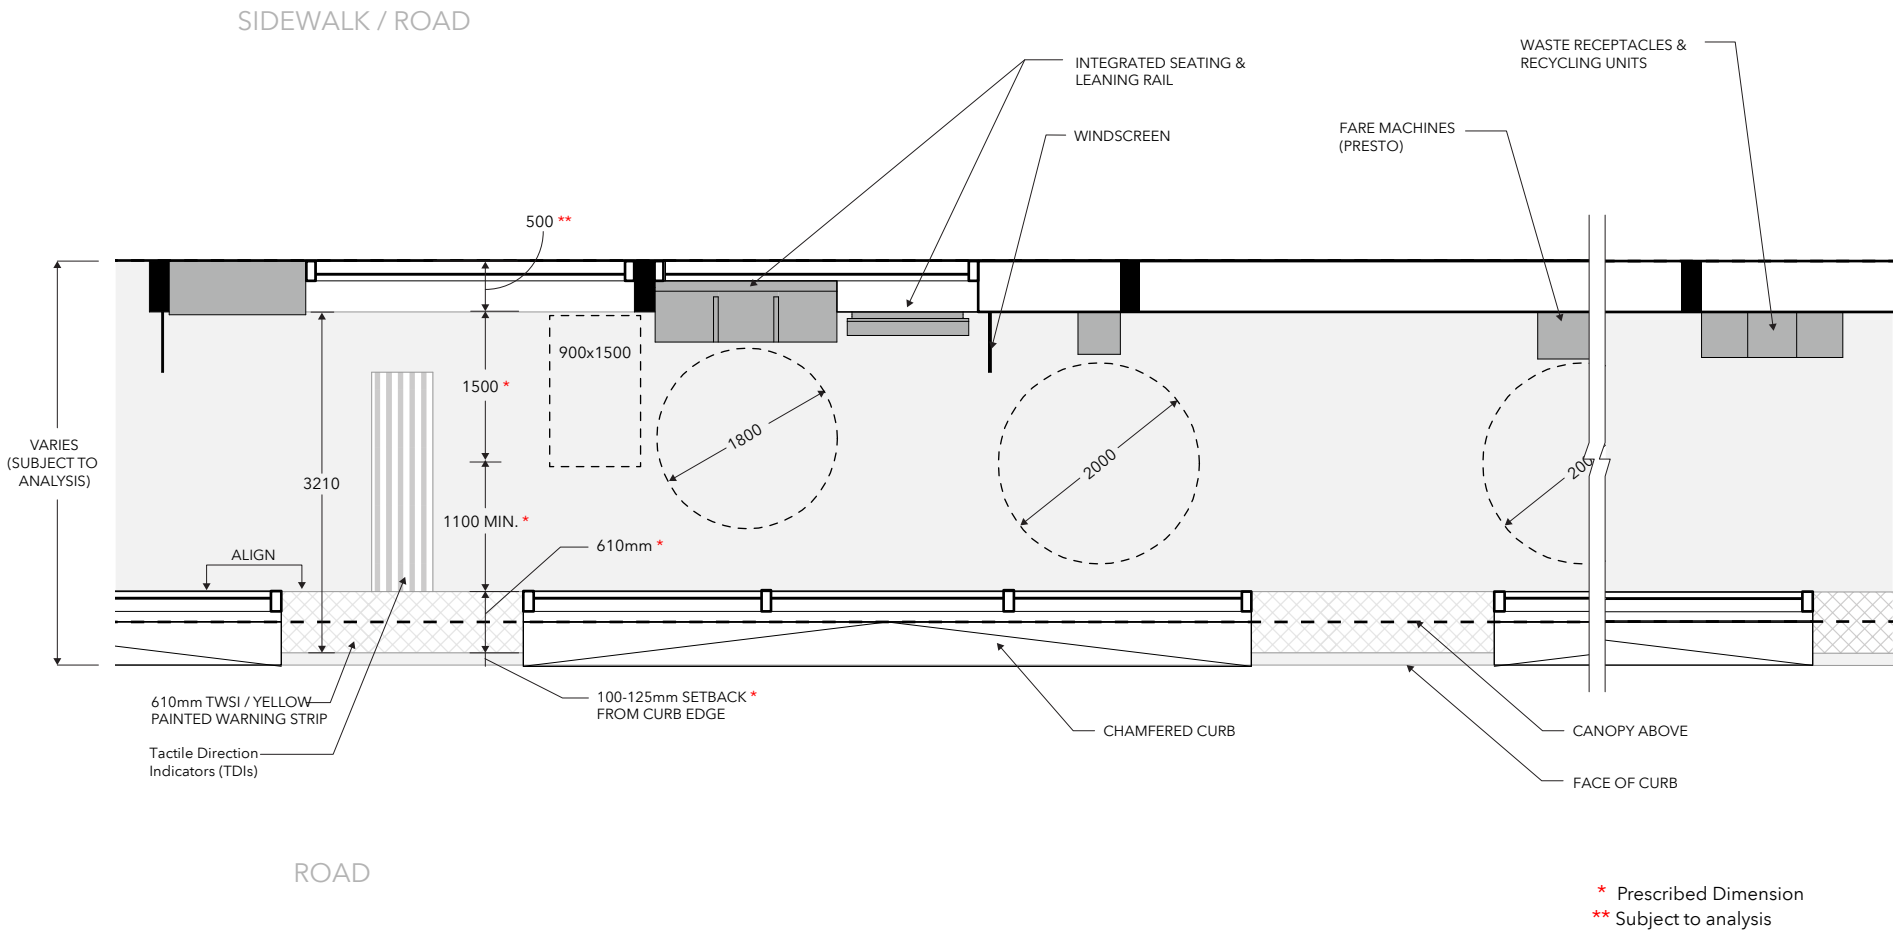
Typical dimensions of pass-through shelters (dimensions in millimetres)
